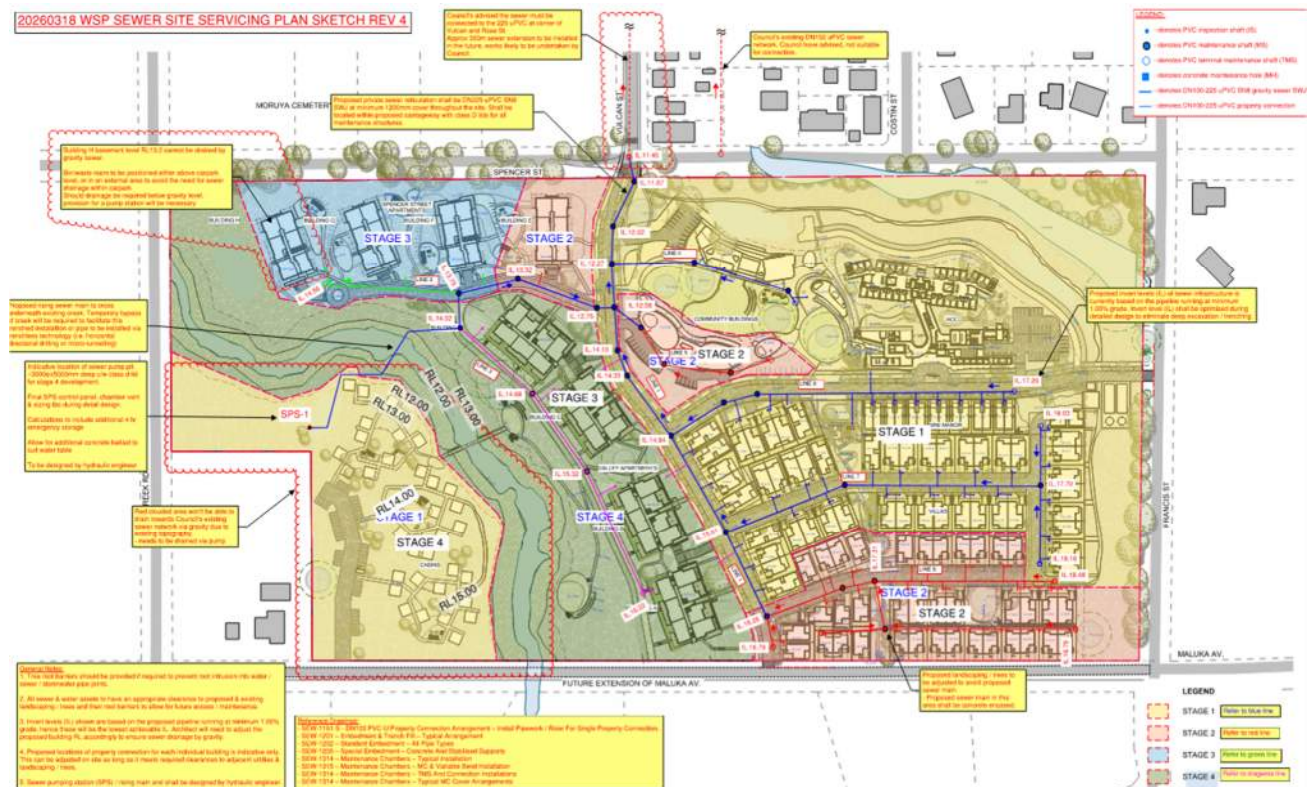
Sewer Infrastructure Concept Design Site Plan
